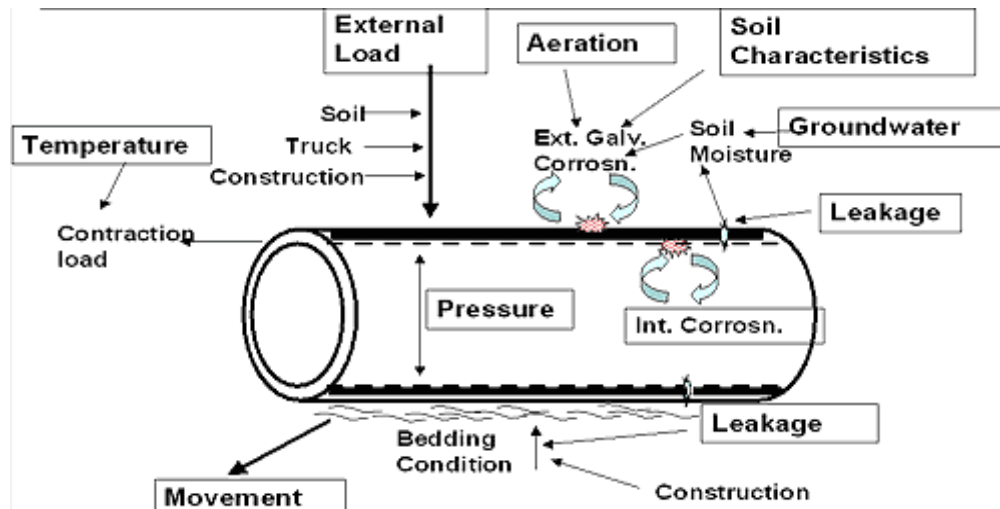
Pipeline and culvert interactions leading to failure (O'Day et al., 1986)
